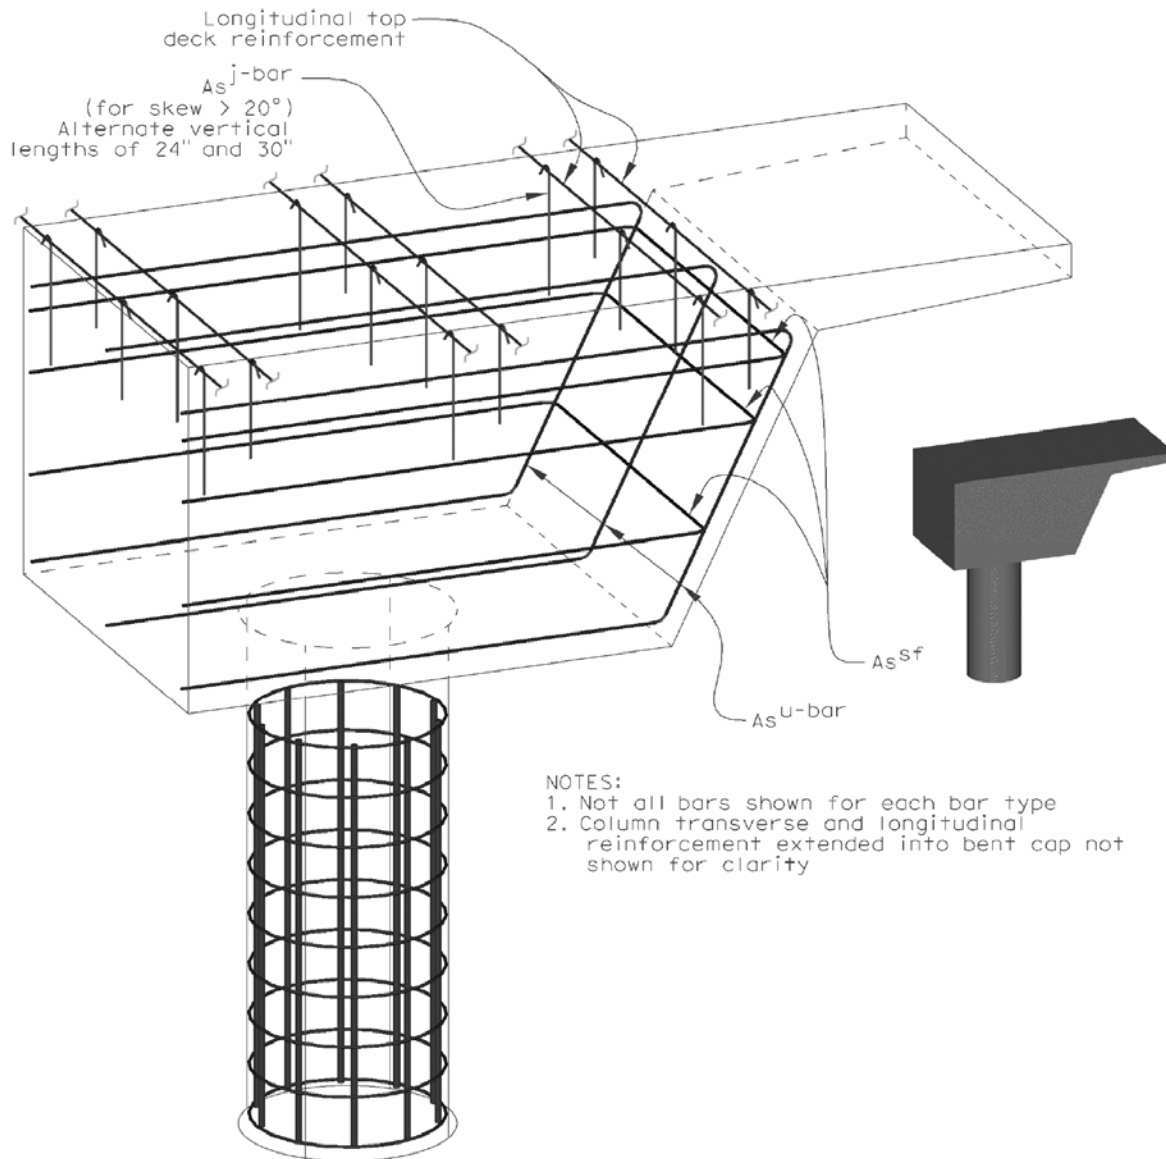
Knee Joint Shear Reinforcement - Skew $\leq 20^\circ$
